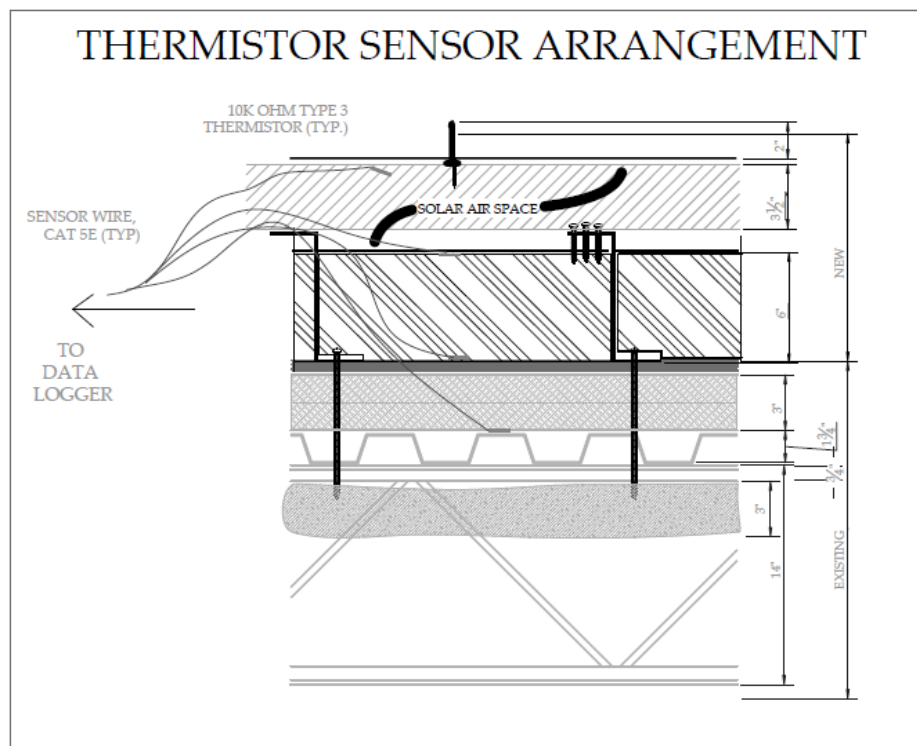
, 9 Thermistor Sensor Arrangement, Roof Section
